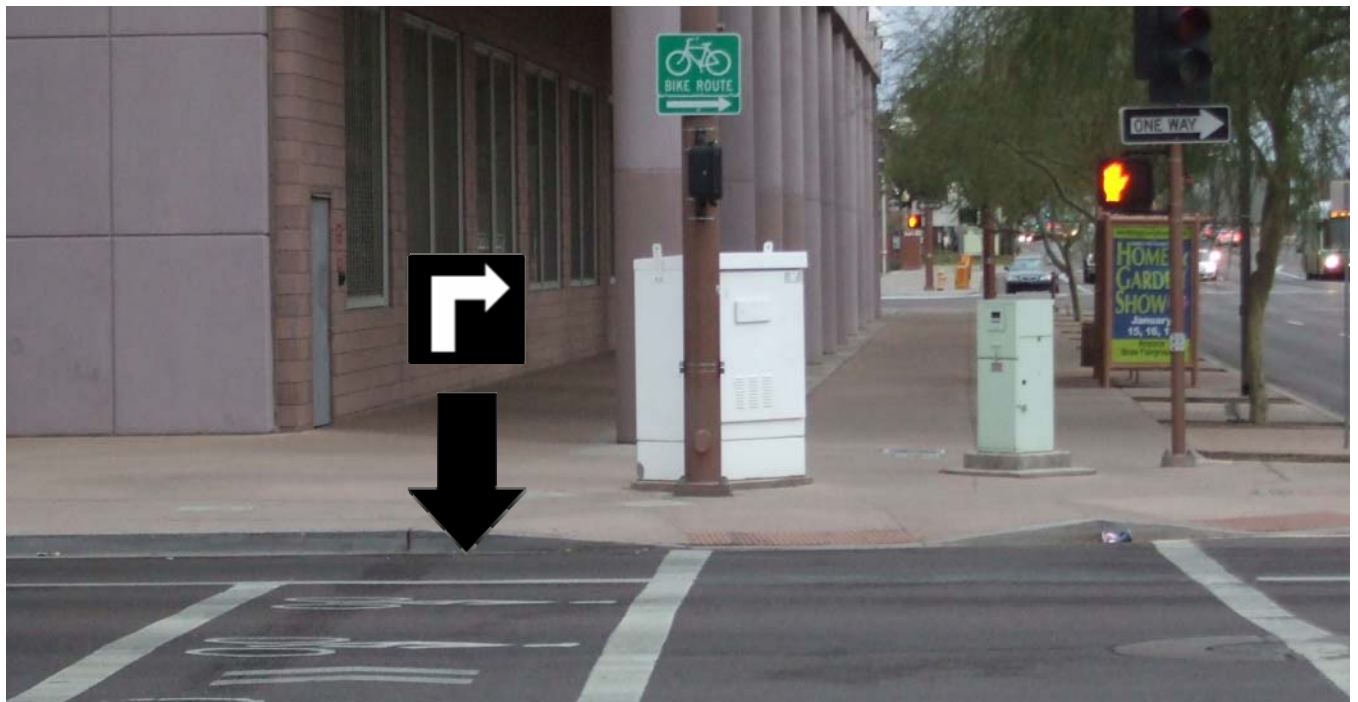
7<sup>th</sup> Street and Jefferson Street – Recommended Traffic Control
